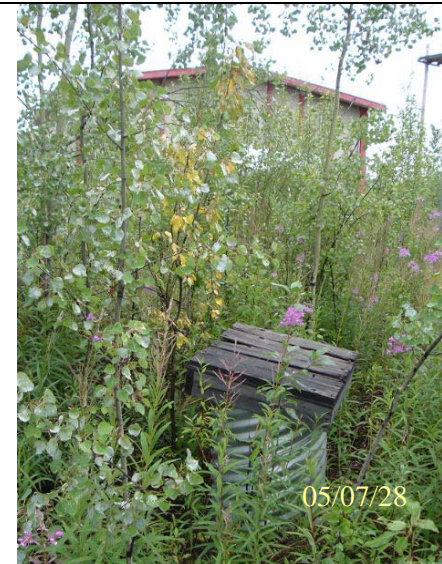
3102 Looking east at septic tank or leach pit (front), fire hall (rear)
